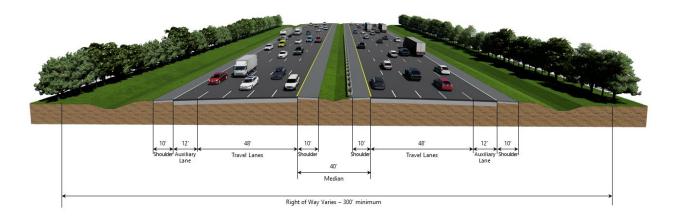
I-95 Typical Section from I-295 to Philips Highway (US 1)
